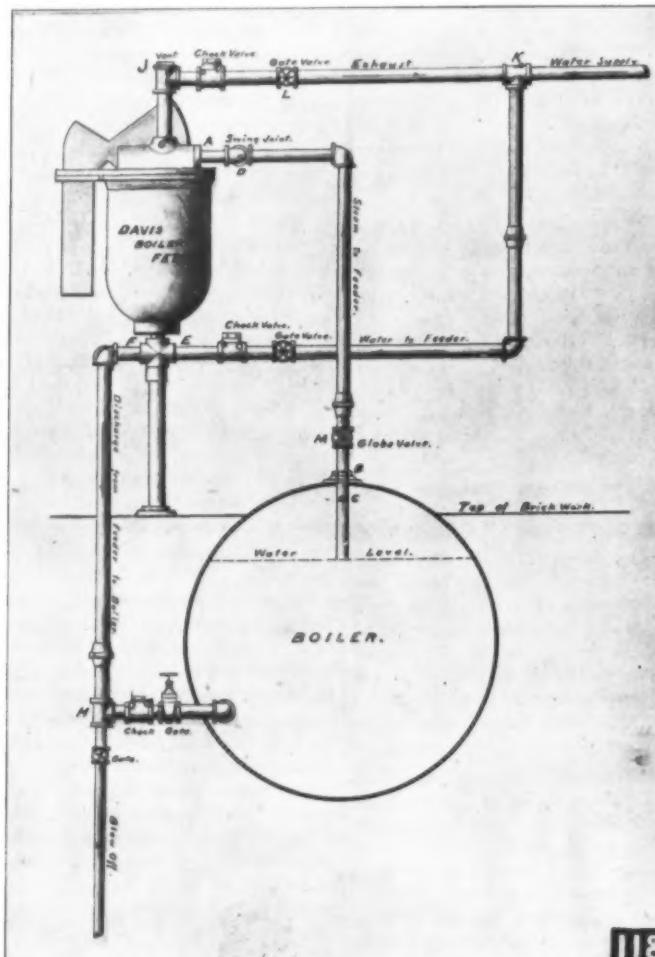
DAVIS BOILER FEED CONNECTED TO A RETURN TUBULAR BOILER.
